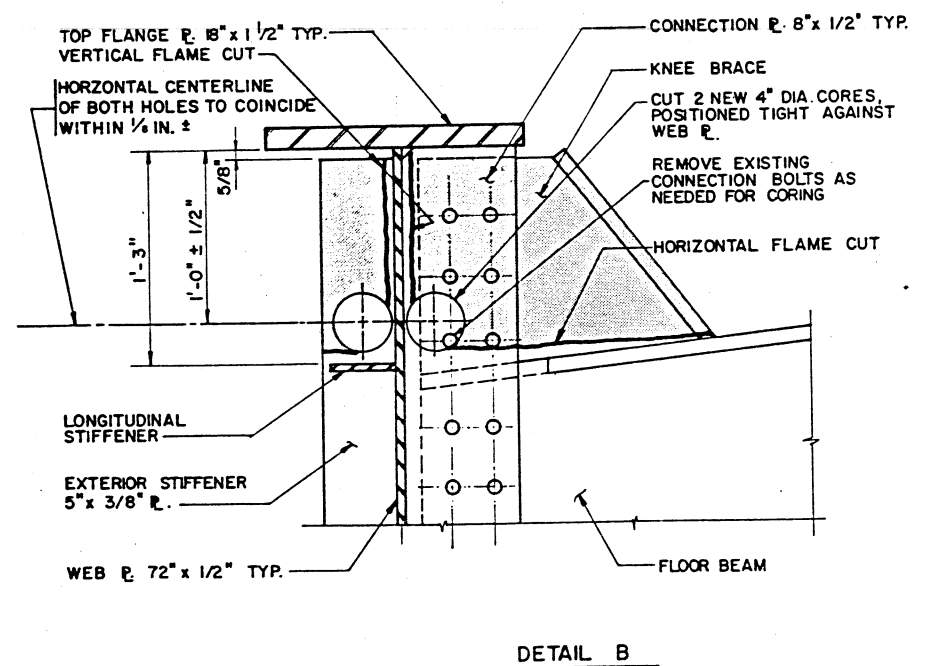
DETAILS FOR REPAIR OF GIRDER WEB CRACKING
